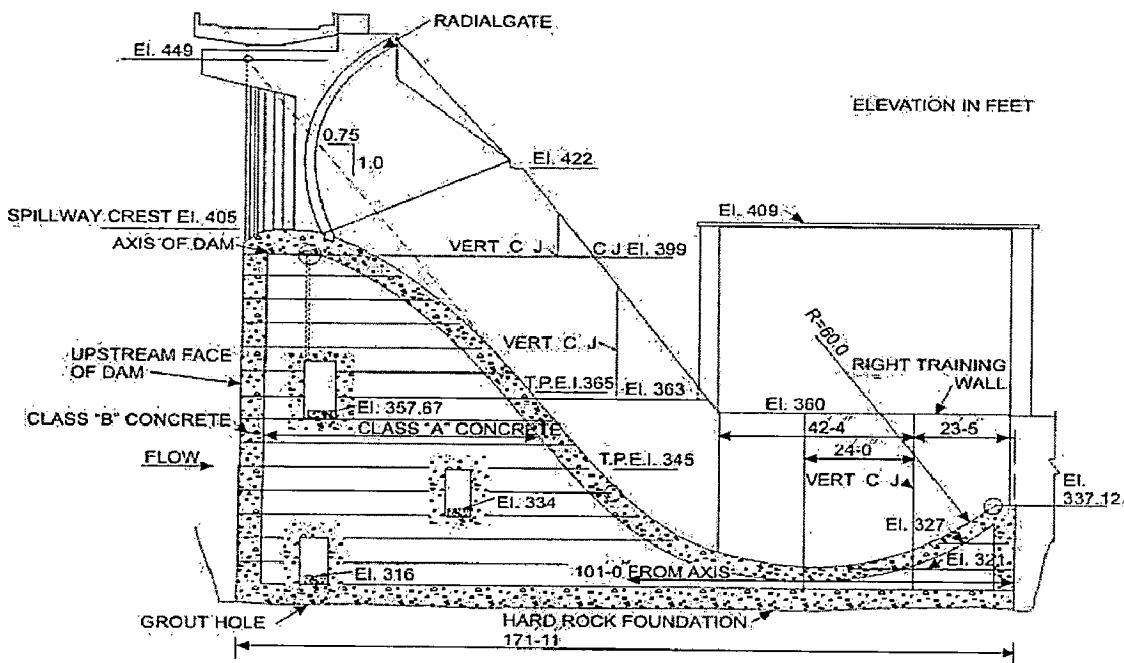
Typical overflow (ogee) spillway .Example of Panchet Dam on River Damodar
